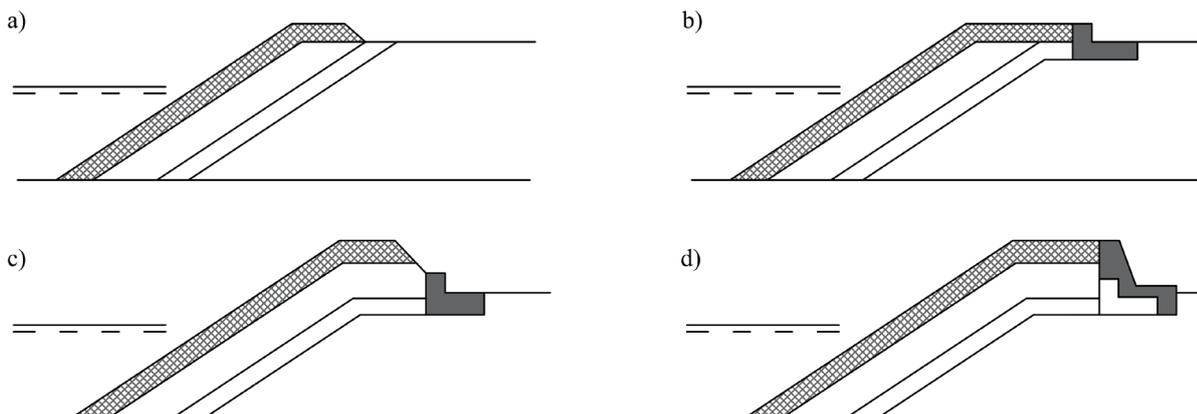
Cross section of typical revetment with increase of crest elevation. Based on Burcharth et al. (2014).
